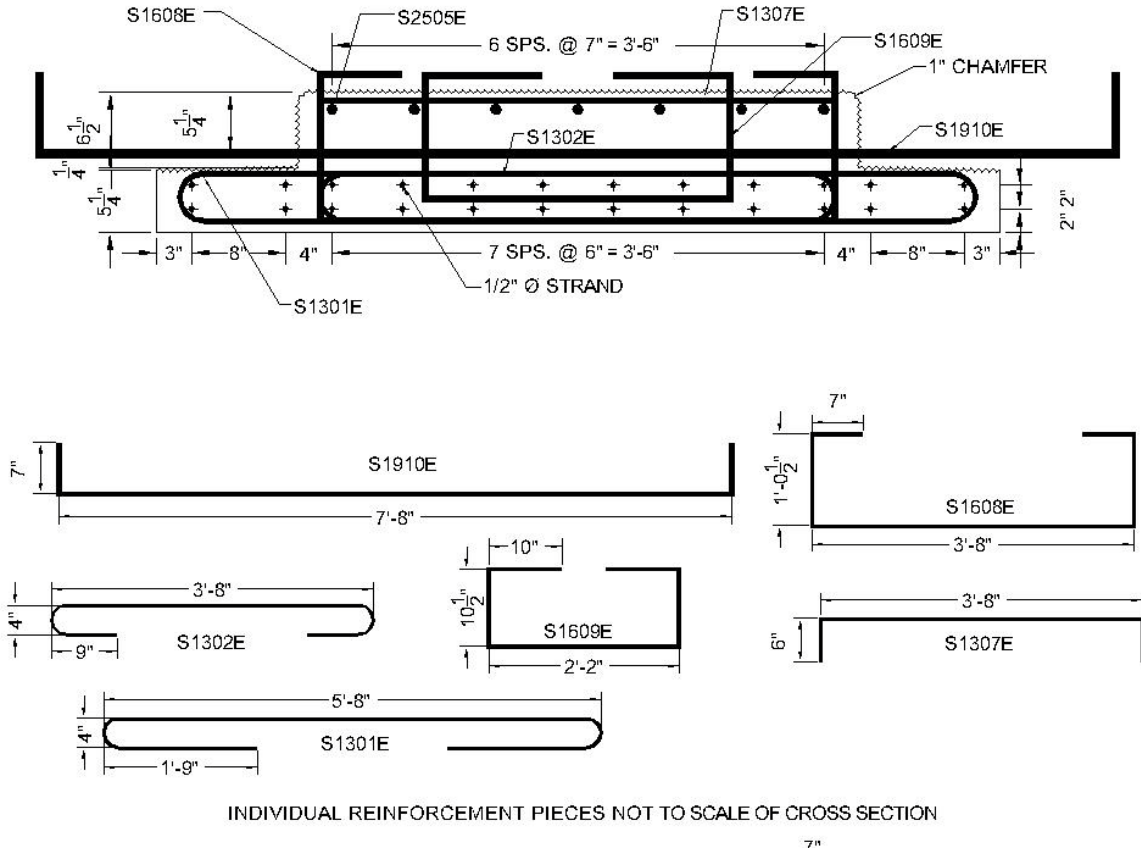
Cross section and individual reinforcement details for west end of precast beam 2S
